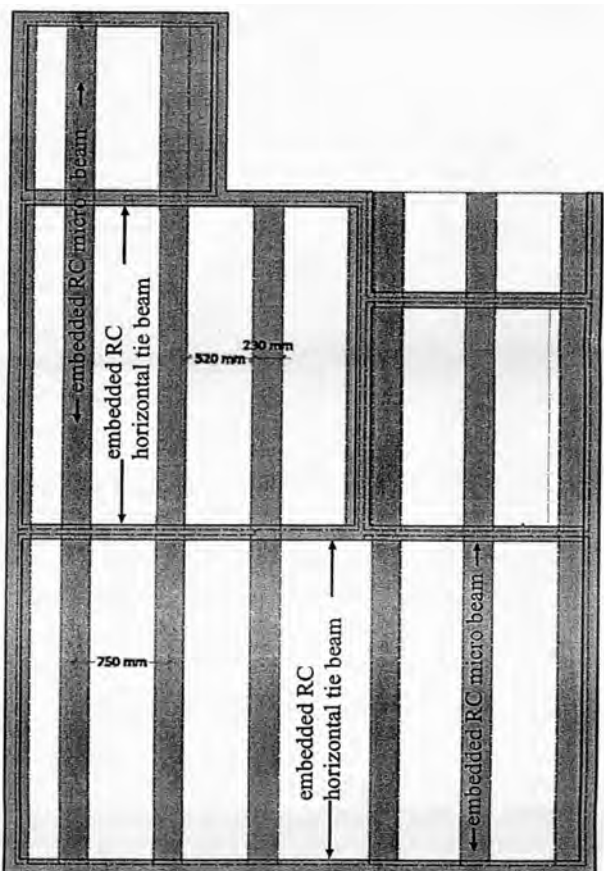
Network of embedded RC micro beams and horizontal tie beam
